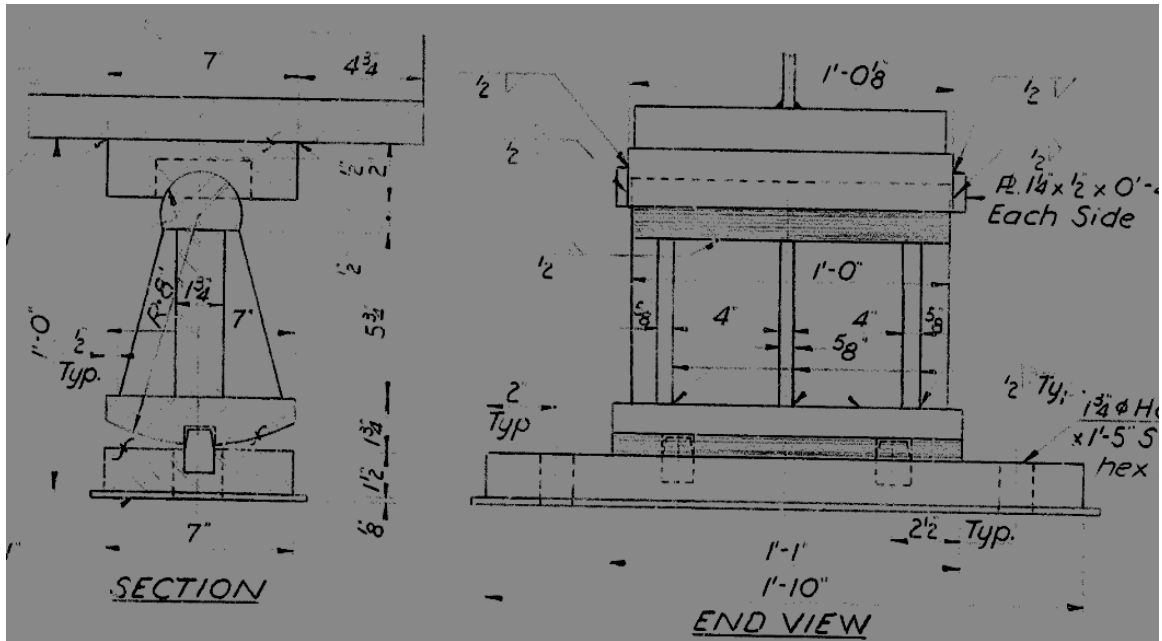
Steel rocker (expansion) bearing details for bearings atop the end abutments (excerpted from structural drawings).
